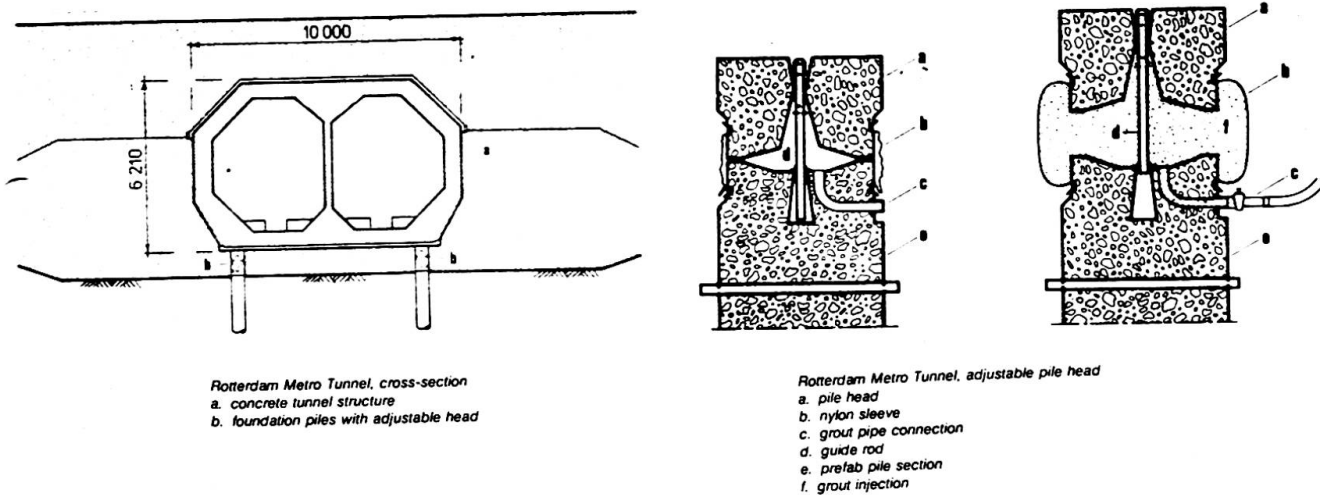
Cross section of Rotterdam subway tunnel and piling system
